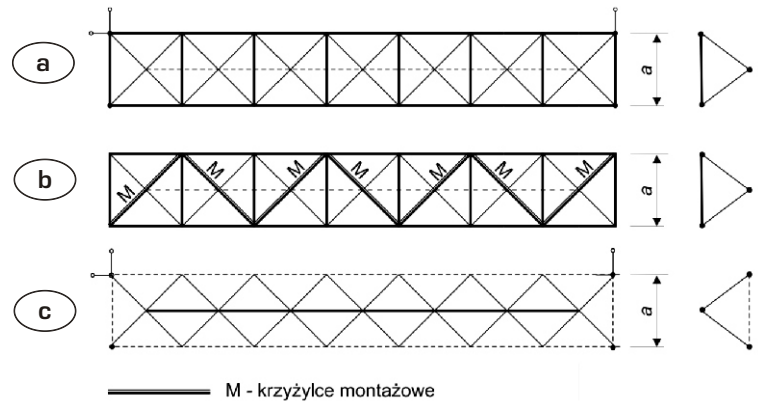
a – geometrically variable assembly segment, b – segment protected by assembly cross-heads, c – assembly segment upturned «upside down»
